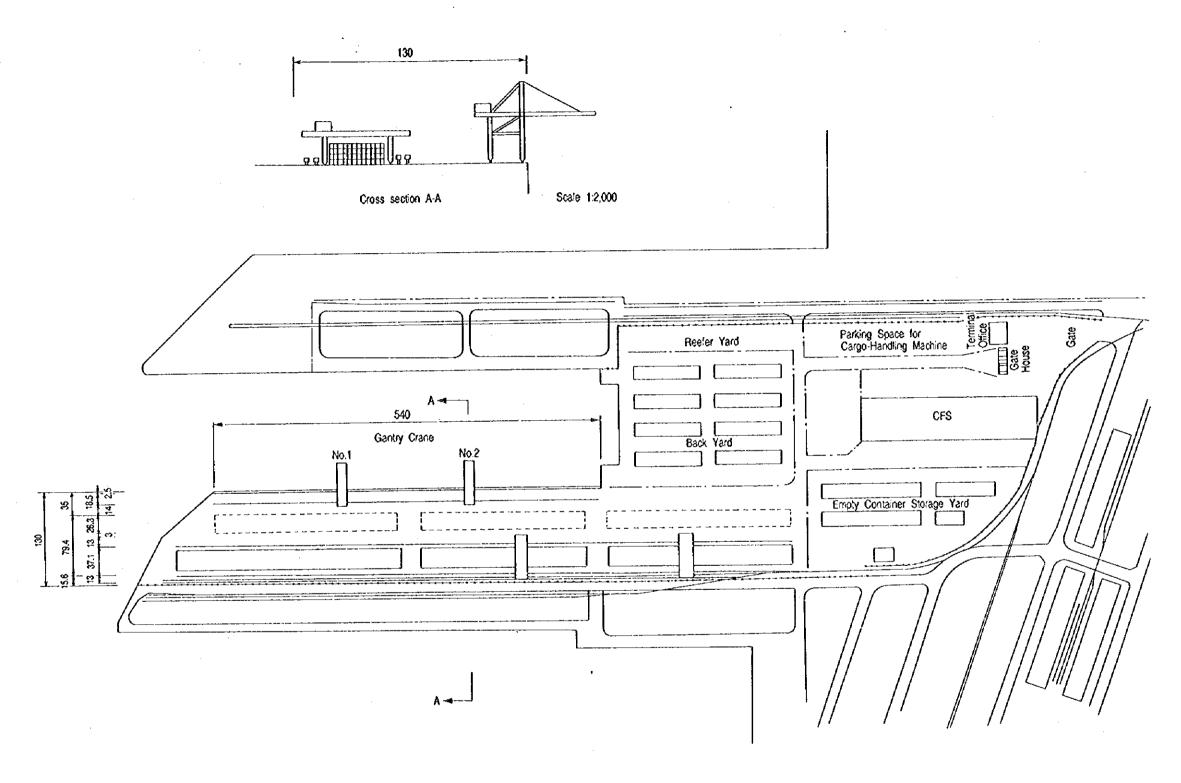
Layout Plan of the Multi-purpose Terminal (Transfer Crane System)
